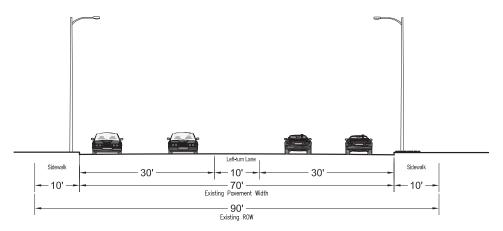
TYPICAL SECTION - REDLANDS BOULEVARD
